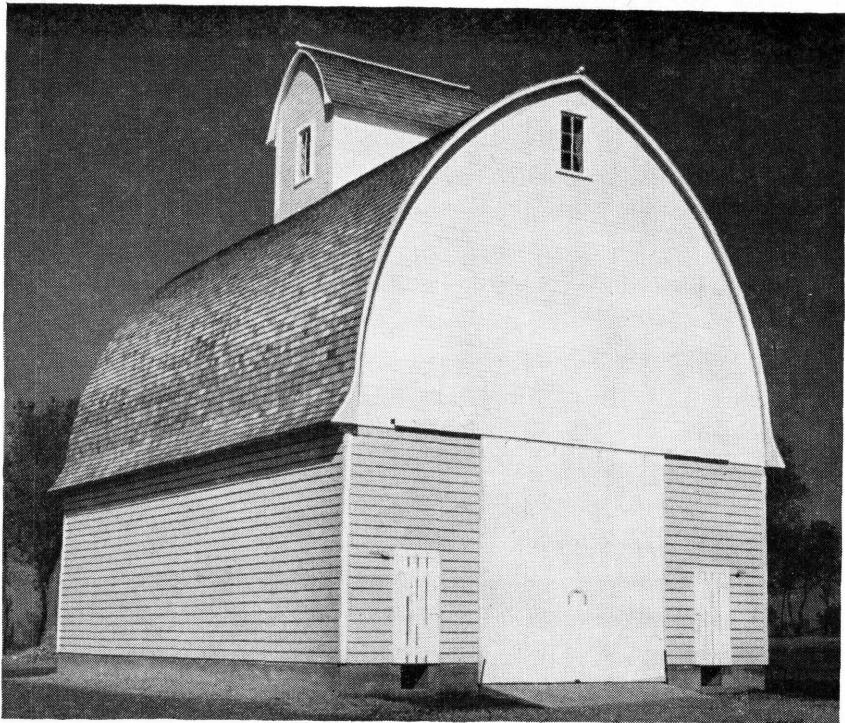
This double crib has a stationary vertical elevator and storage bins over the driveway. Shelling trenches have been installed under the crib areas.
